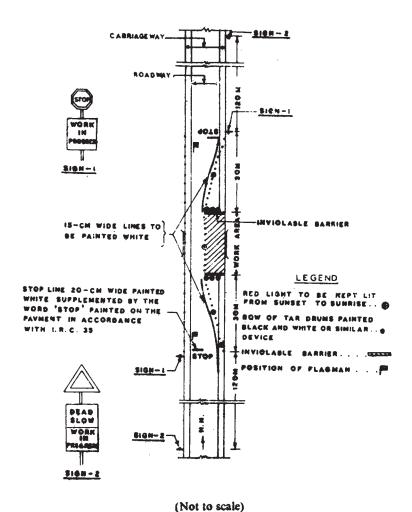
Arrangements during reconstruction of cross drainage structures where traffic can be passed over part width of the structure
